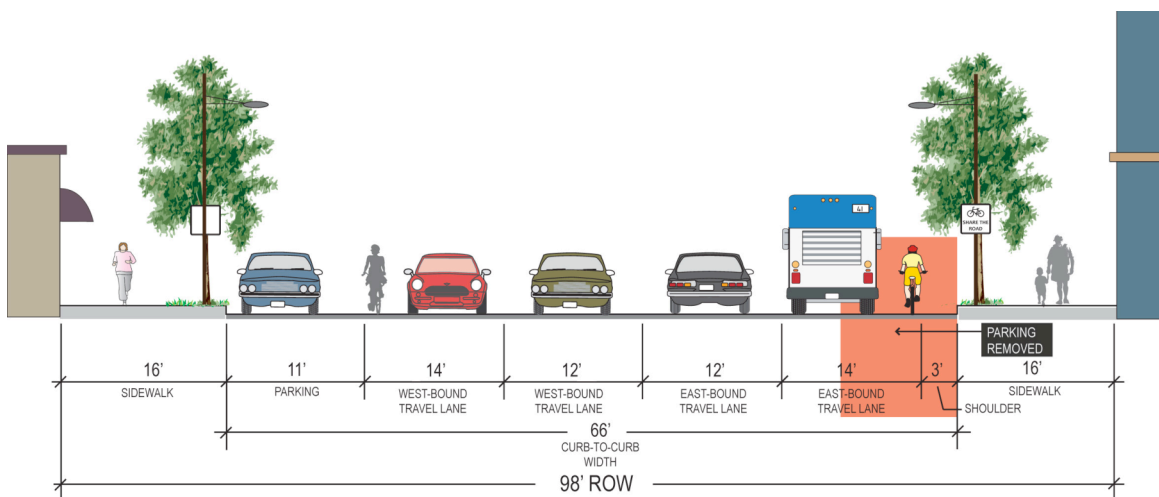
Project opponents’ vision for four lanes plus extra-wide parking and travel lanes leaves no room for parking on one side of the street.
